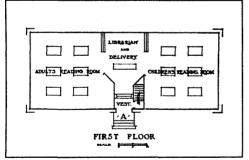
Plan A's layout of the reading rooms was open, with space dedicated to children's and adults' sections.
